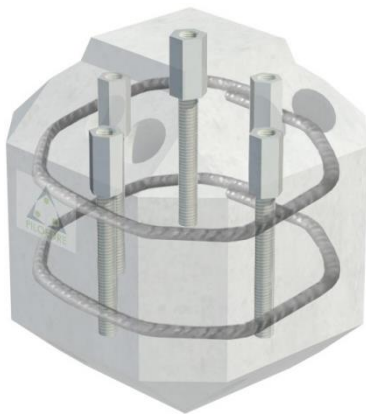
Typical distribution of steel reinforcements and connections (5) in the concrete block.
